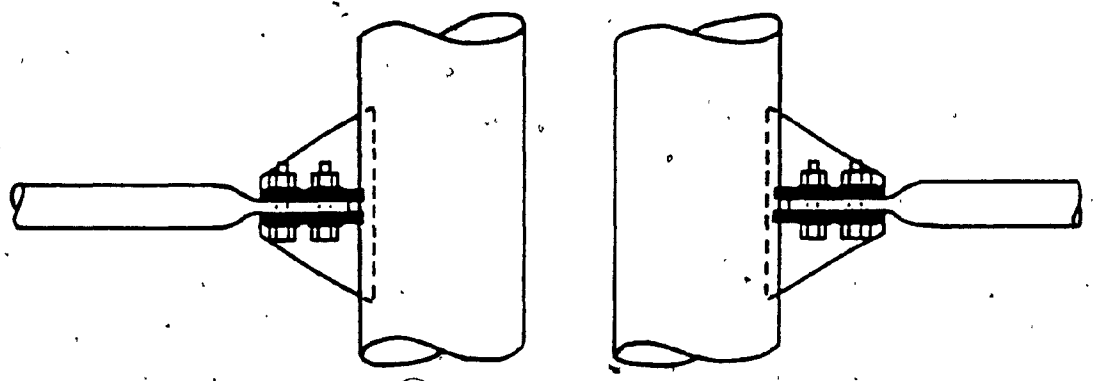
TOP VIEW OF A TYPICAL CONNECTION BETWEEN A STIFFENER OR BRACING TRUSS MEMBER AND A RING MEMBER.
